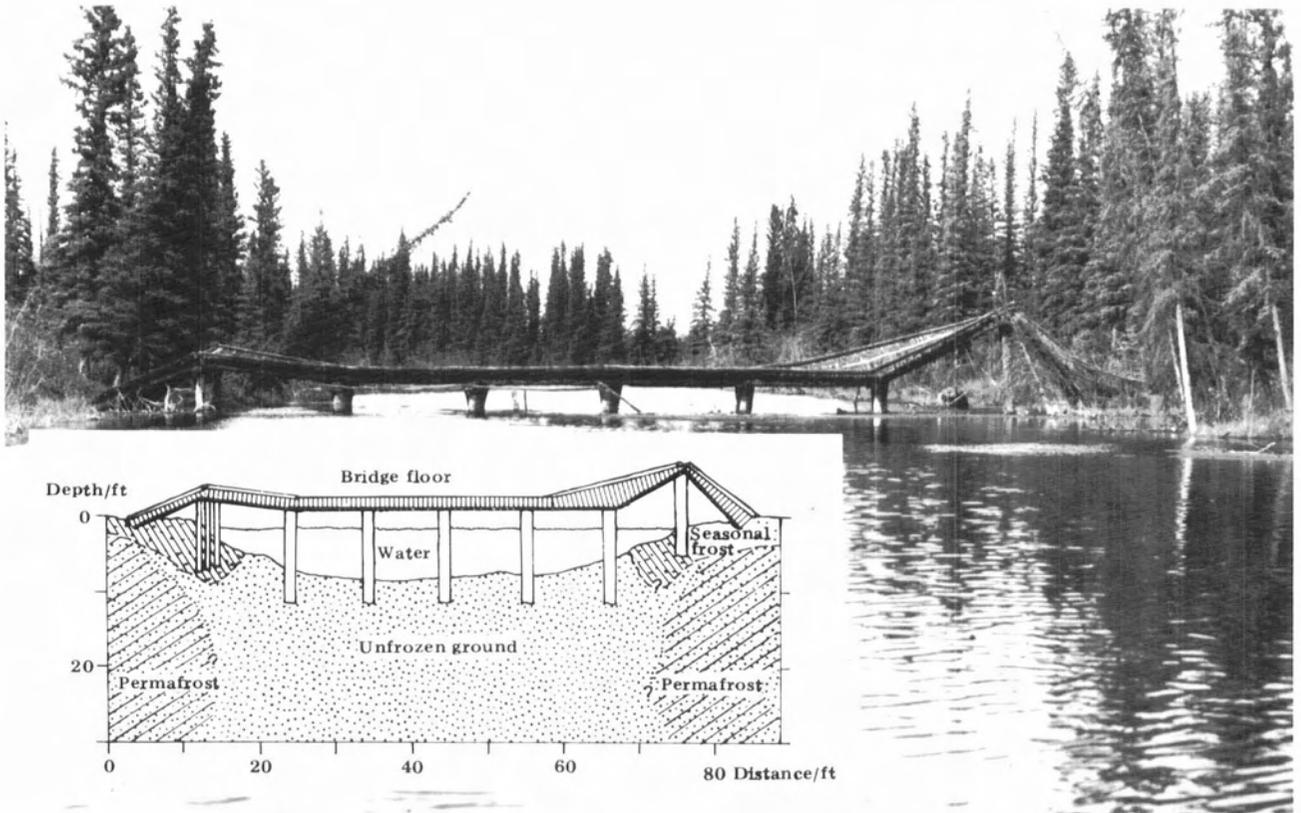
Frost-heaved wood piles of bridge spanning outlet of Clearwater Lake, 6 miles northeast of Delta Junction. Center piles are not affected by frost heaving because ground under creeks that are deeper than 3 feet does not freeze. Photograph 591 by T.L. Péwé, August 15, 1951 (modified from Péwé and Paige, 1963).
